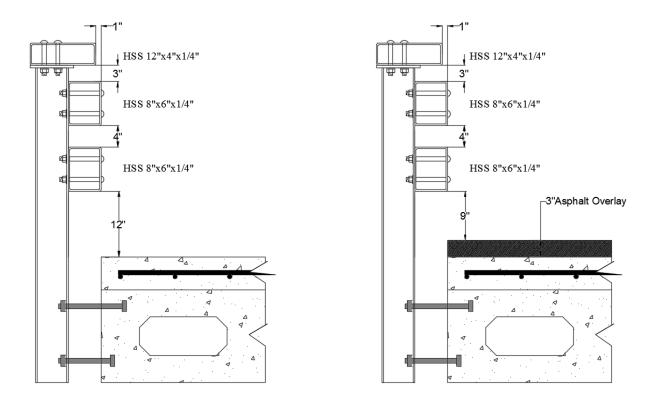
Final Bridge Rail Configuration on Deck #3 for New MASH 2016 TL-4 Bridge Rail
